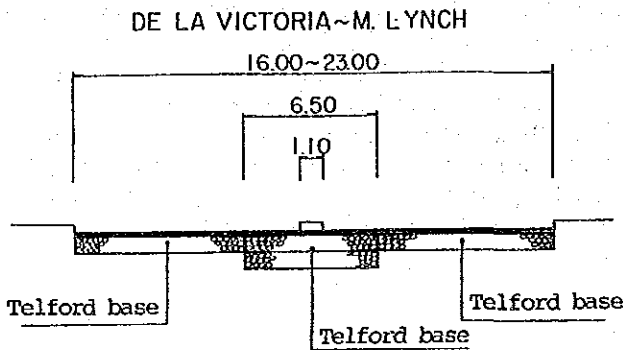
PAVEMENT STATUS OF EUSEBIO AYALA AVENUE
